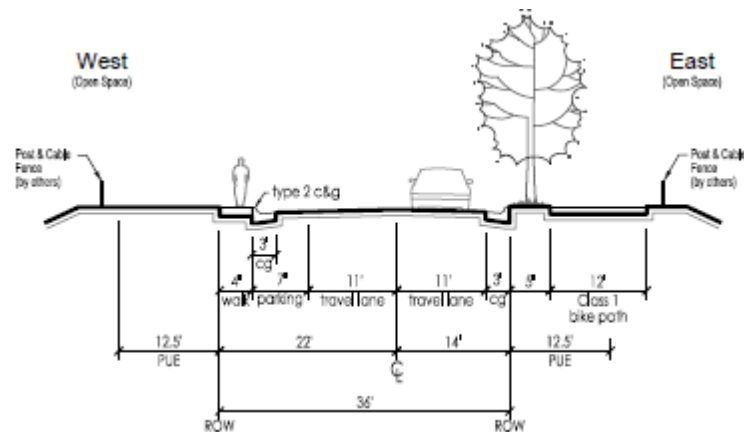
SOUTHPOINT DRIVE STREET SECTION
